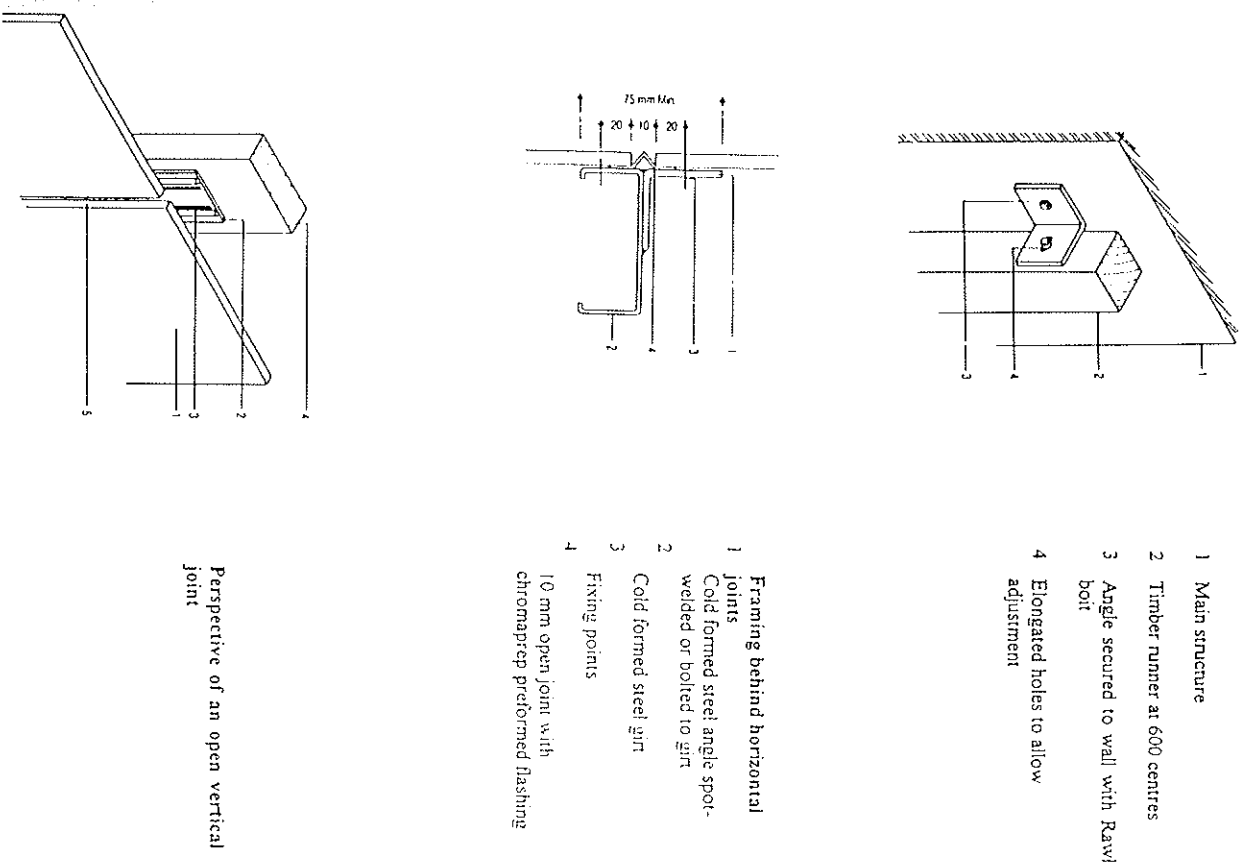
Examples of details for fixing large panels. (a) simple connection, (b) framing behind horizontal joints, (c) perspective of an open vertical joint.
